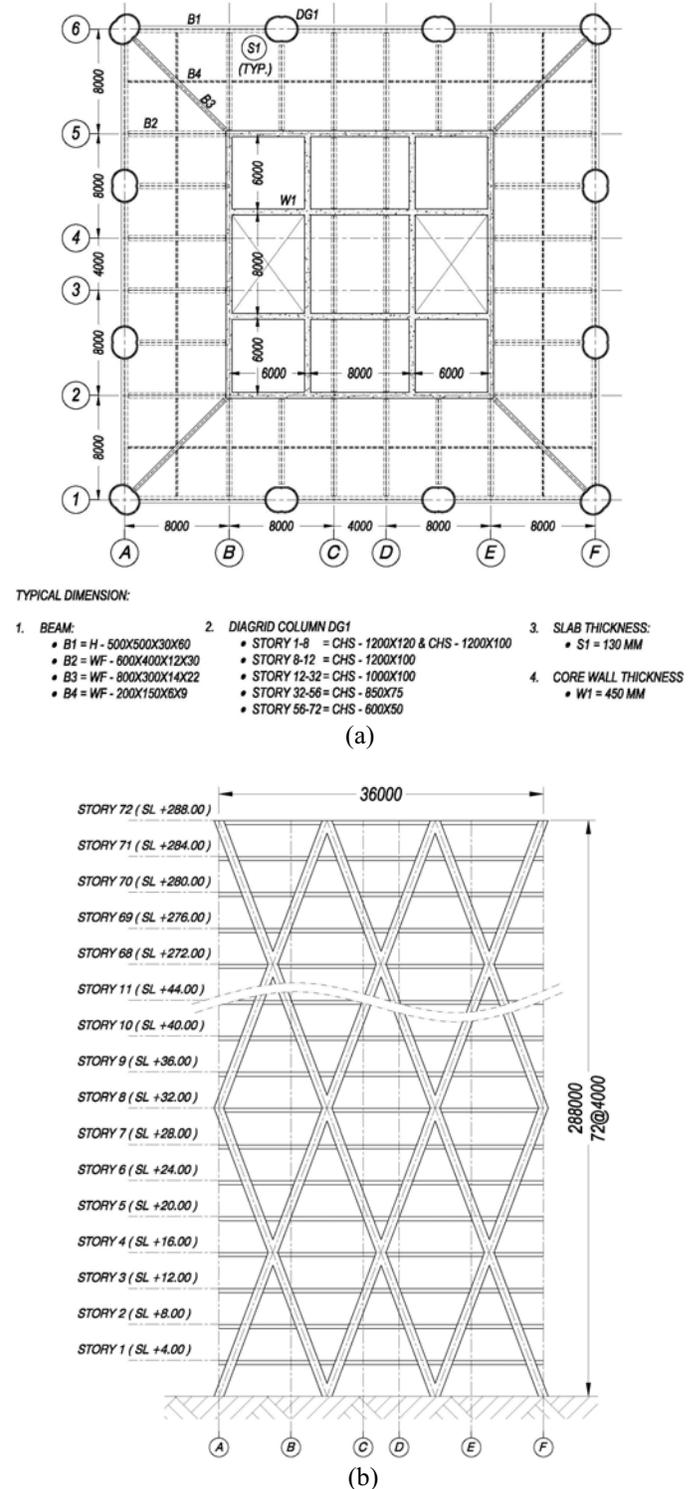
Prototype building drawing: (a) plan view, (b) truncated elevation view; all dimensions are in mm.
